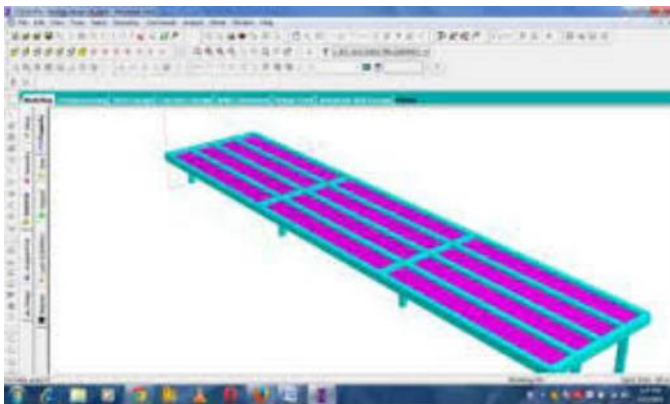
Analysis of Girder Bridge in Staad Pro
